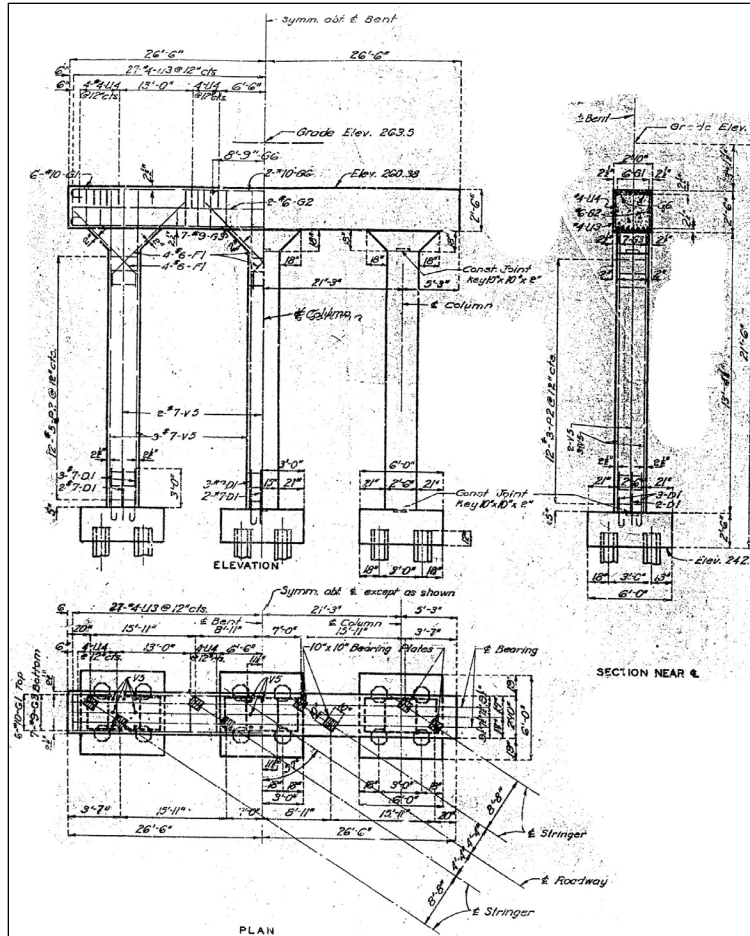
Intermediate bent details of the L472 Bridge (a concrete cap supported by three columns)
